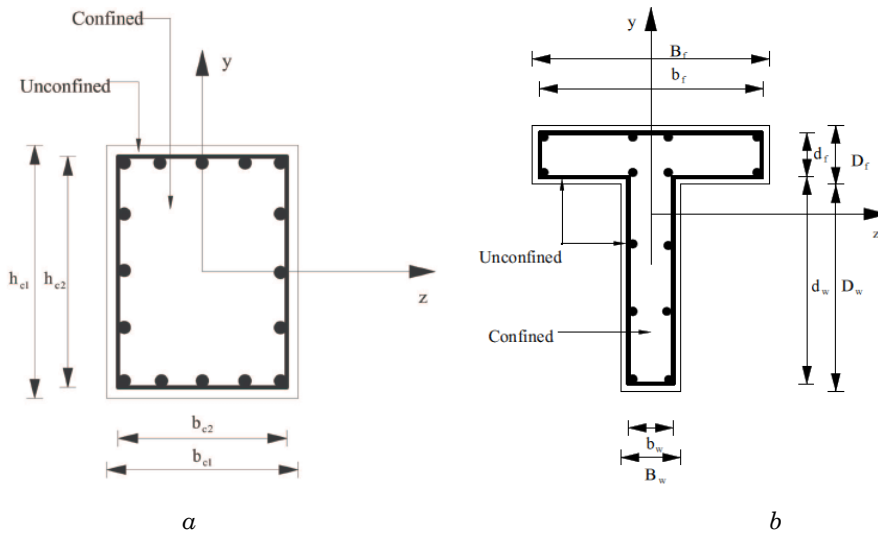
ADAPTIC fibre section types adopted in the finite element model: a) RCCS; b) RCTS. [63]
